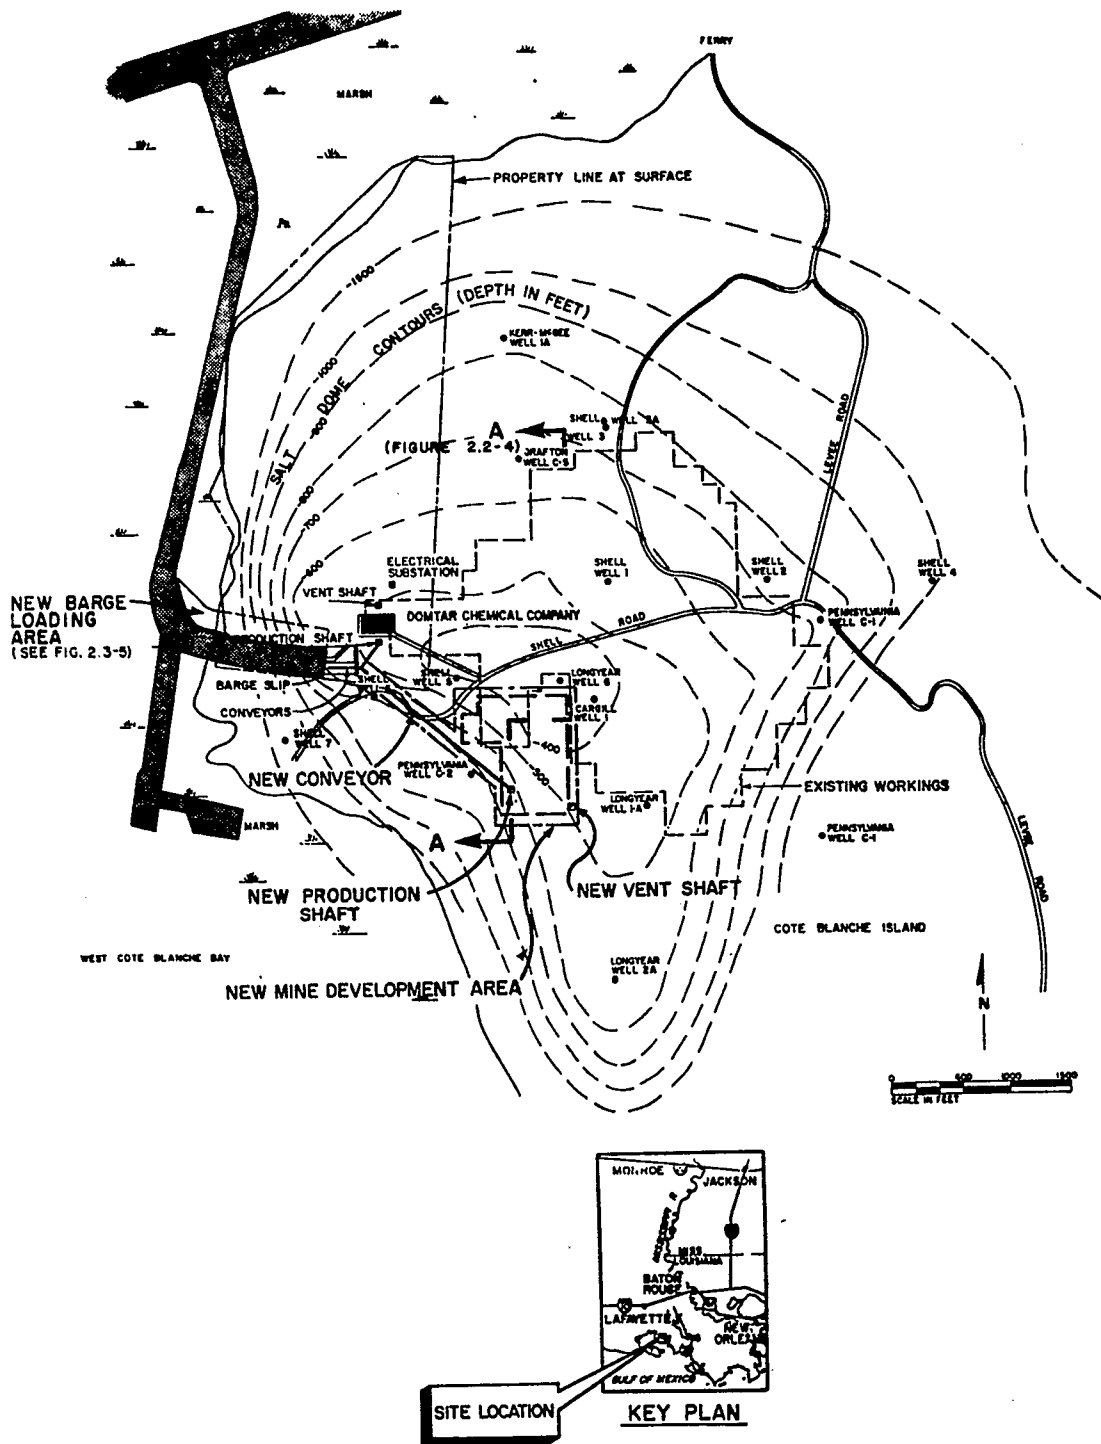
Site plan - Cote Blanche mine, Cote Blanche Island, Louisiana.
